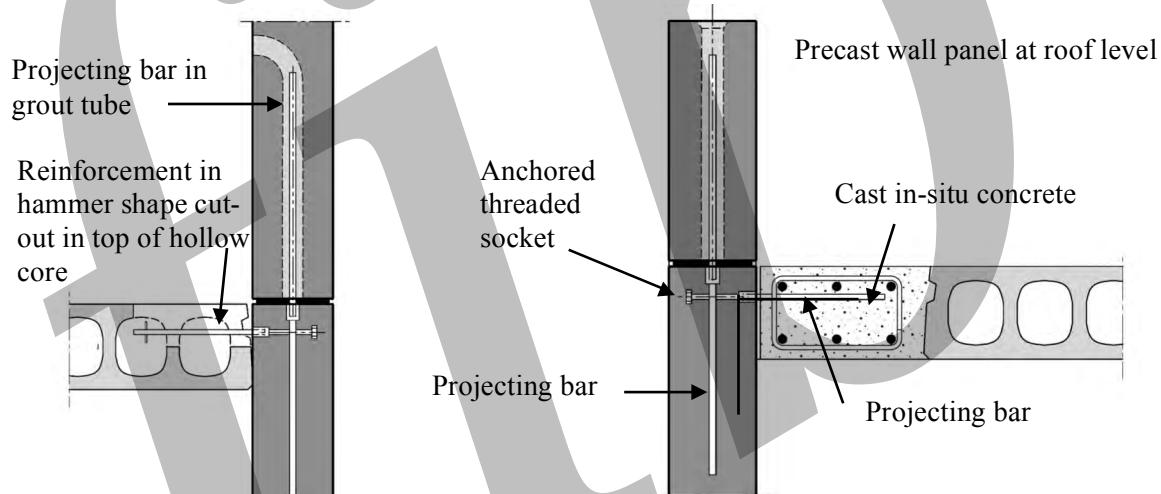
Connections at lateral joint of hollow core floors and roofs
